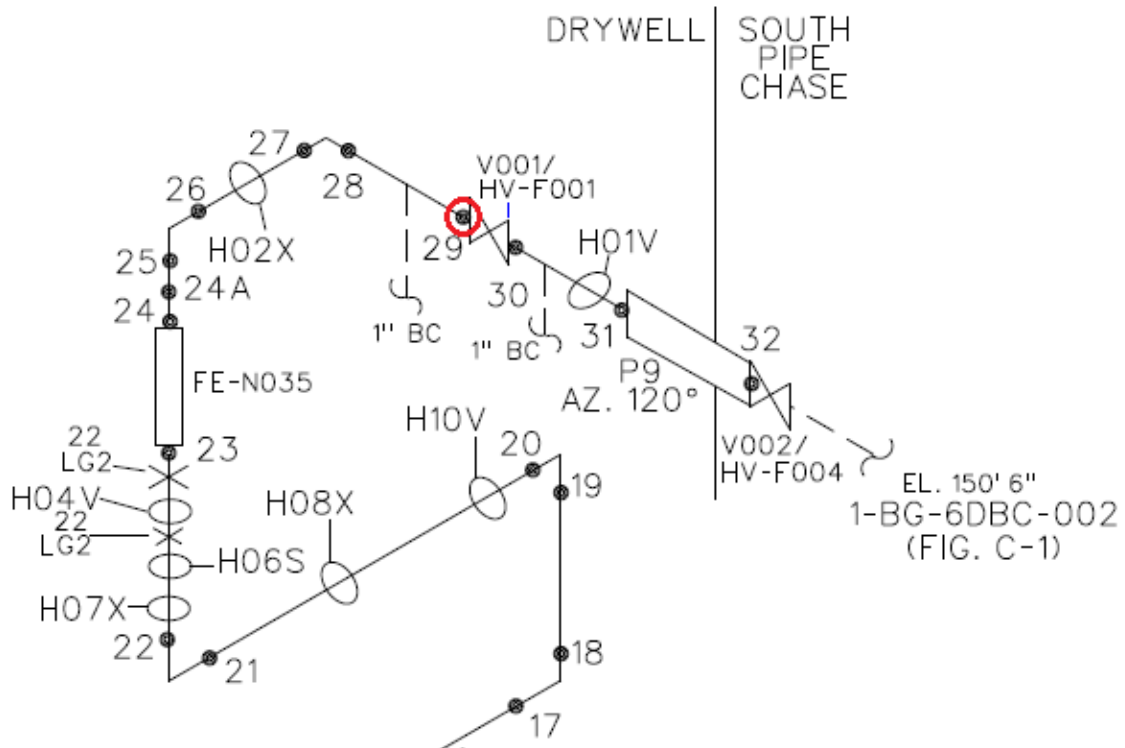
Weld 1-BG-6DBA-001-29 (Extracted from Reference DWG A-36)
